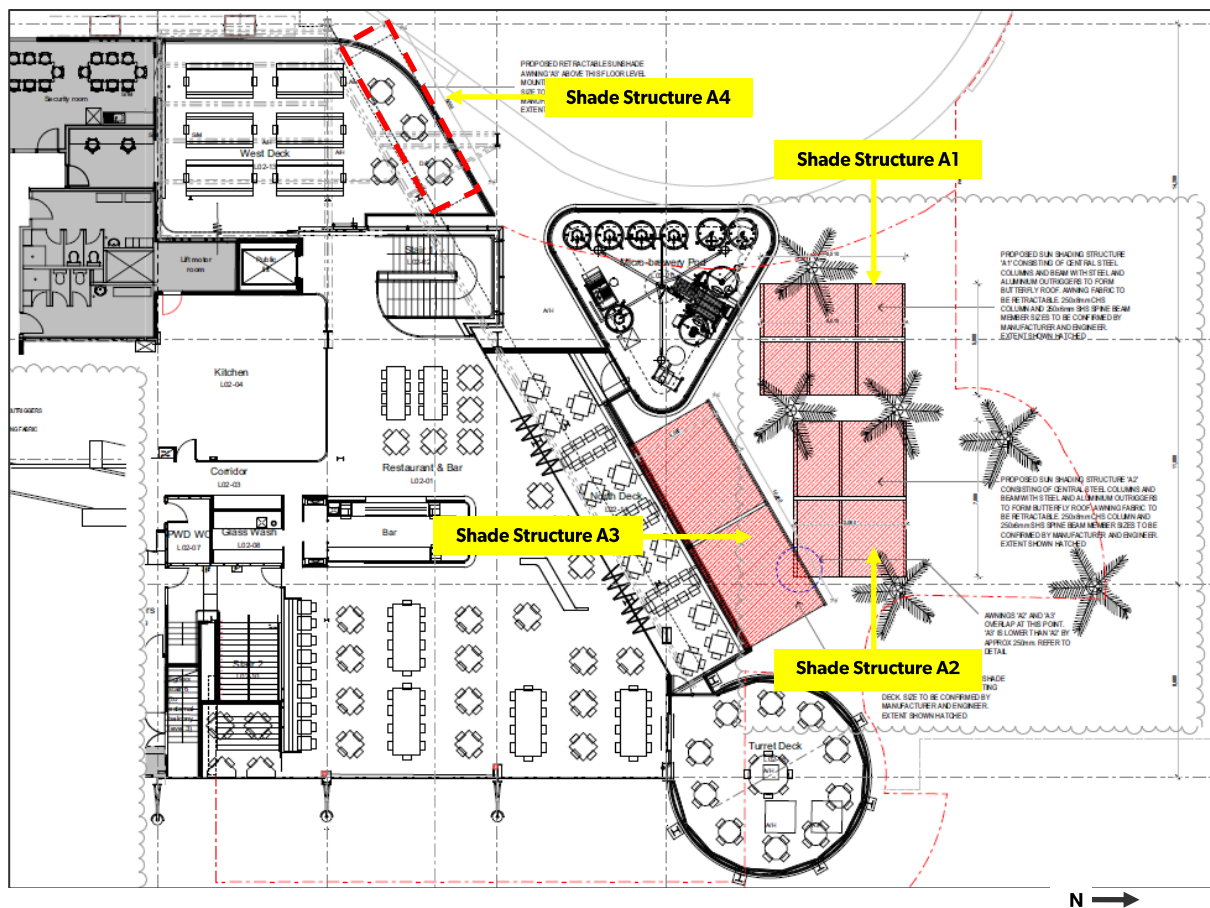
| First floor plan of Tenancy 5 showing the location of the proposed shade structures (Base source: Applicant's RtS)
